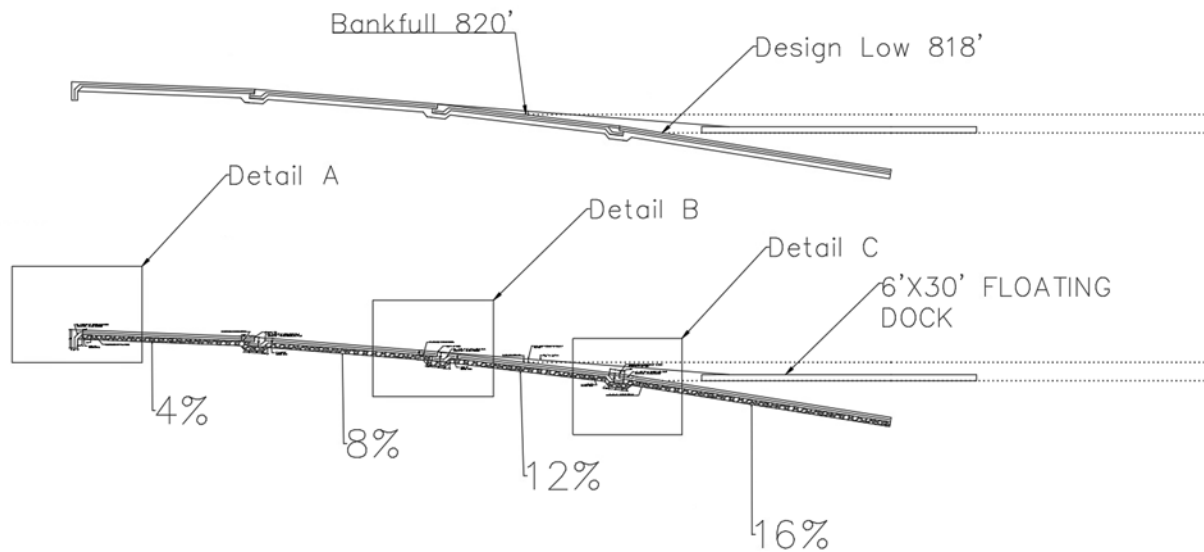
17 Boat ramp section slopes and side profile with detail locations
